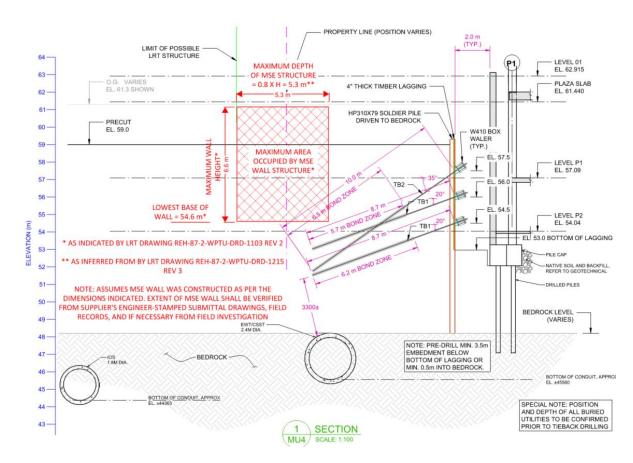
Overlay of MSE wall on updated proposed Support of Excavation section
